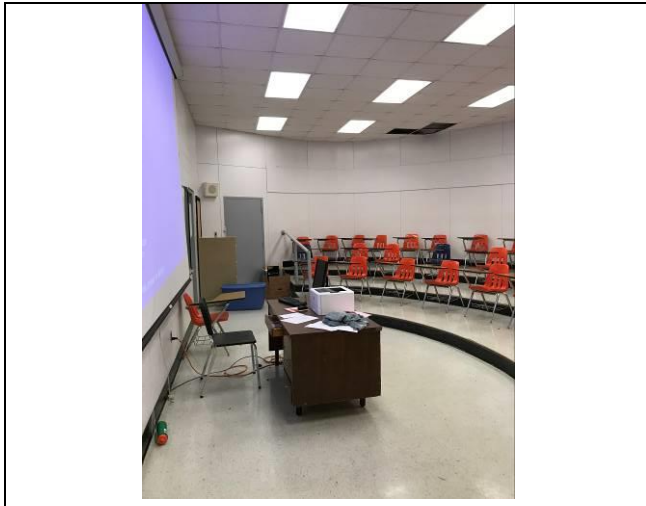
View of typical interior finishes inside the film room of the Davis Gym.
